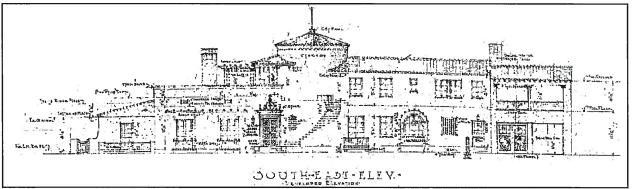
South and East Facades (expanded elevation), Permit #1547 Drawings - 1925, Phineas Paist, Architect
